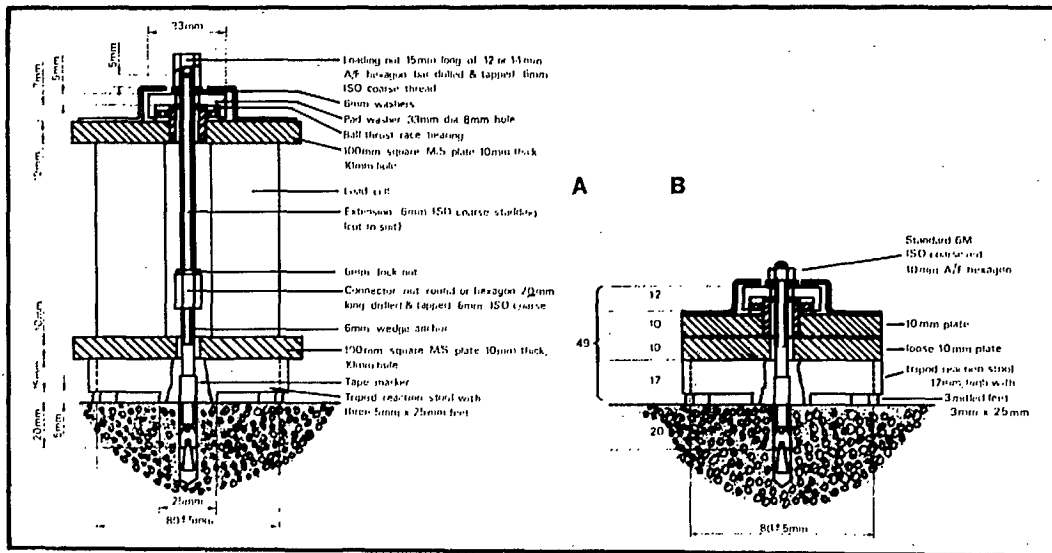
Equipment for "wedge anchor" pullout technique, A. assembly for use with load cell, B. assembly for use with torque meter; from reference 35
